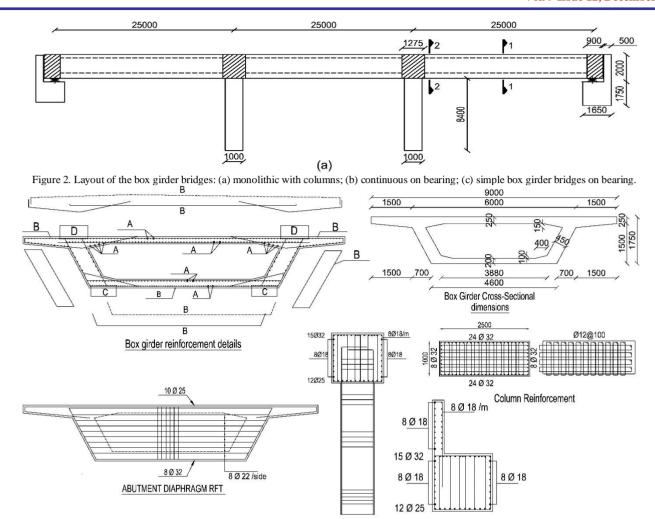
Dimensions of the box girder and reinforcement details of the bridge elements.
